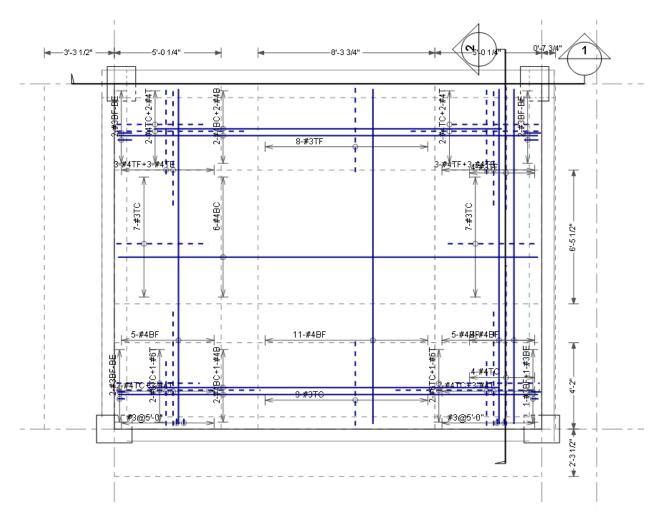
Slab detailing of 16th Floor (Partial)
